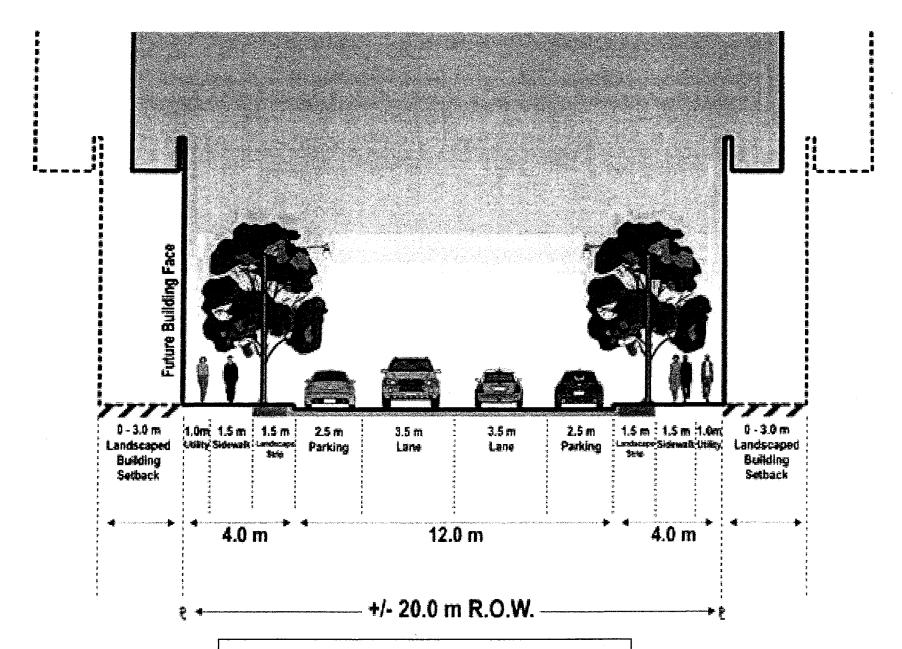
LOCAL ROAD AND STREETSCAPE (without transit)
